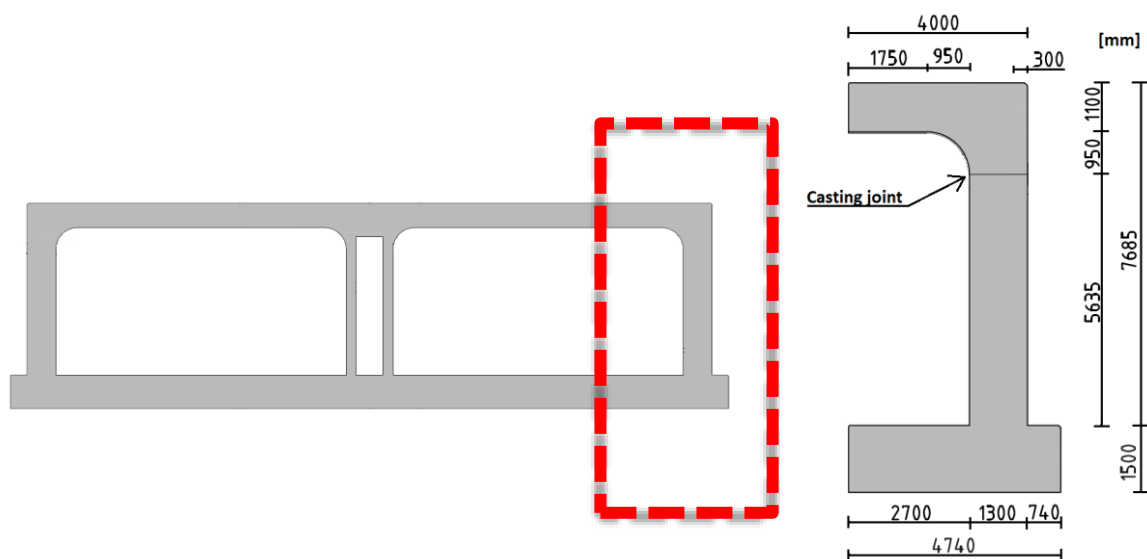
Cross-section of the tunnel and the analyzed tunnel segment.
